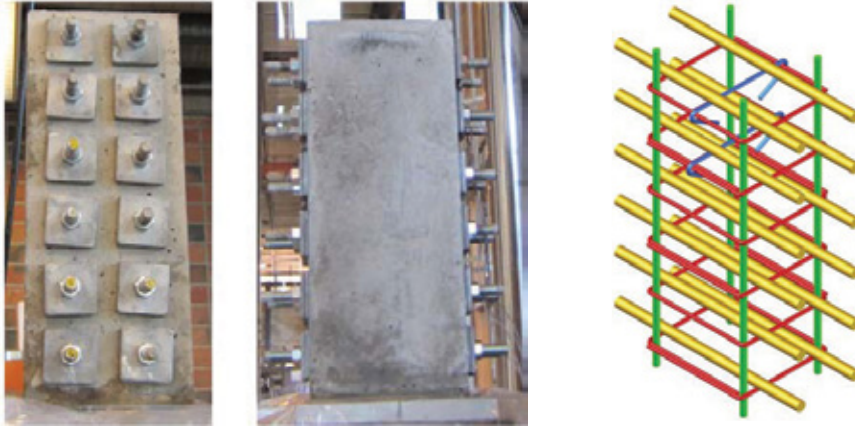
Threaded bars with plates and bolts attached, and a 3D model of the threaded bars.
